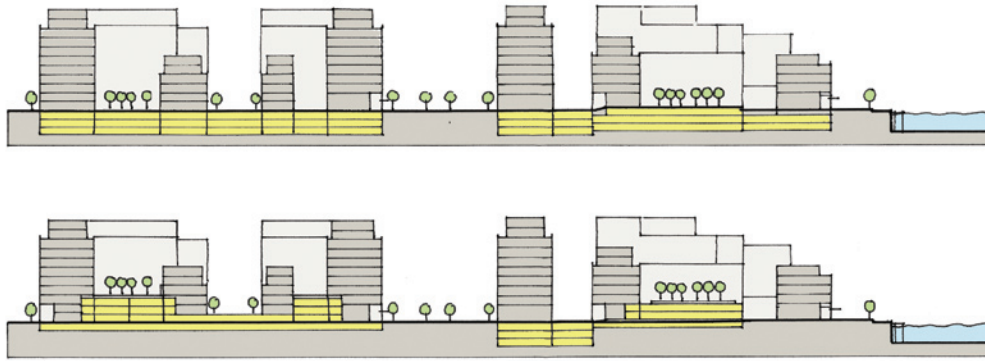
Section showing examples of potential locations for underground or above ground parking structures
